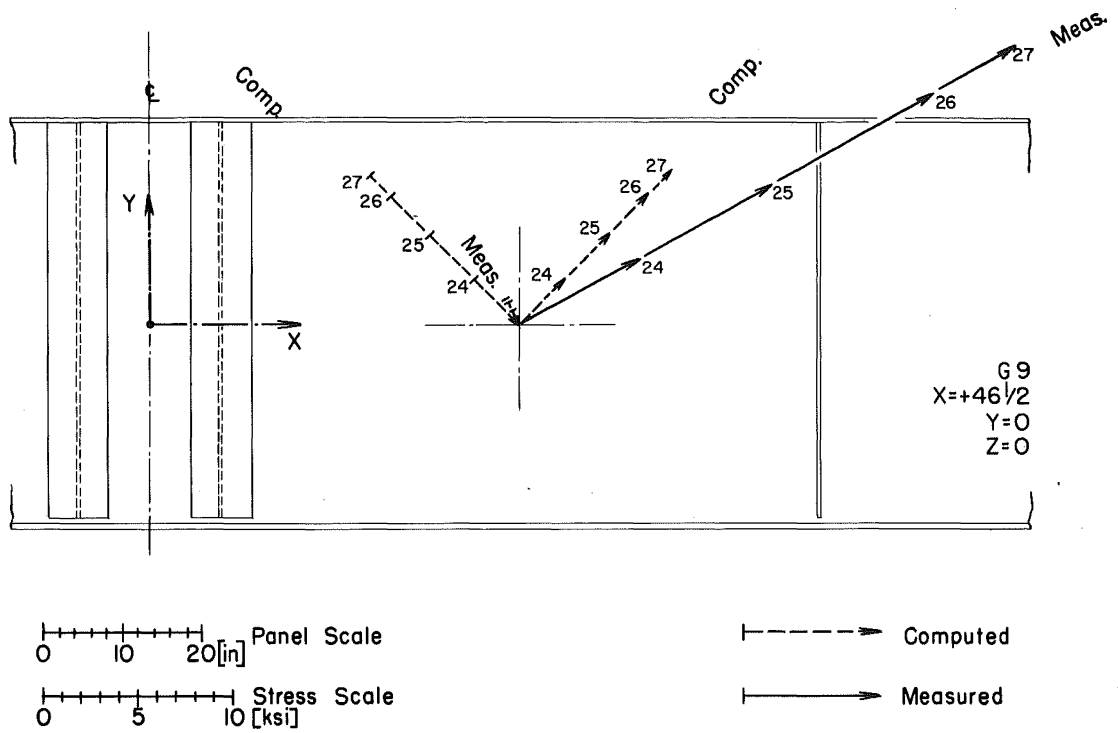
Principal Stresses at Panel Center, Girder G9
